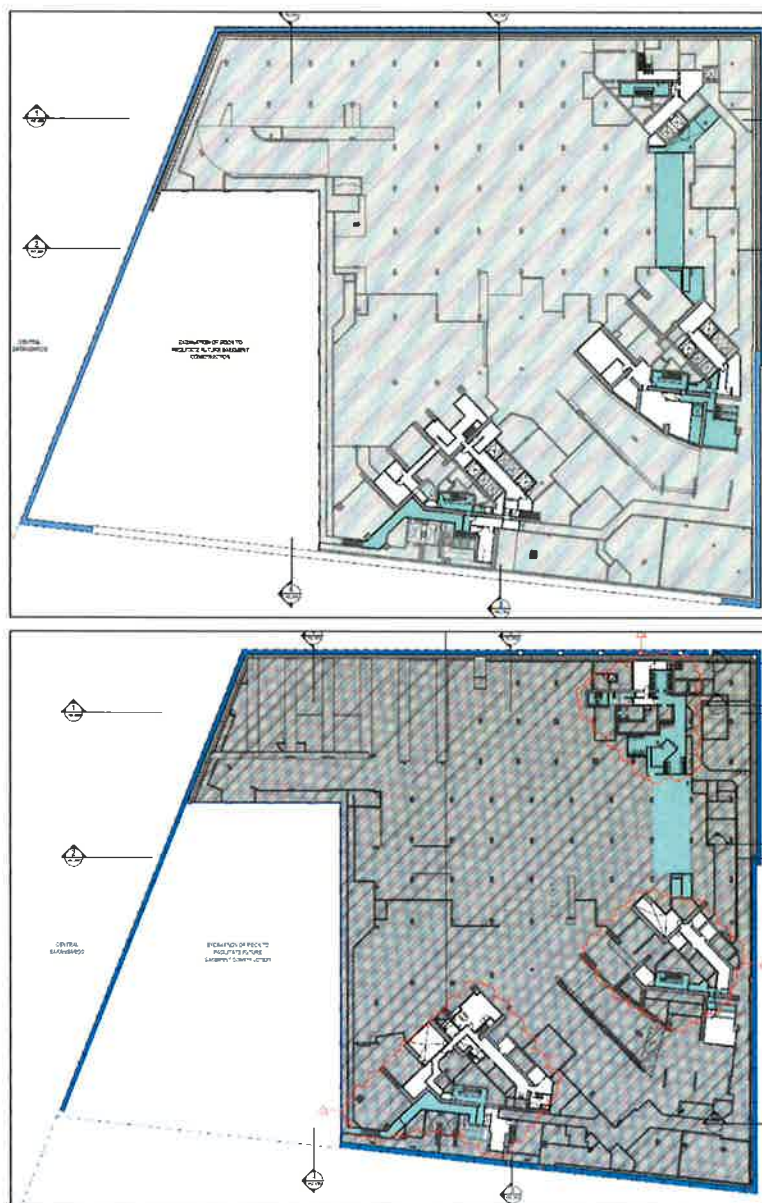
| The approved (above) and proposed (below) plant room layout and structural columns of Basement Level B0 shown by the red clouding (Base Source: RPBW Architects)
